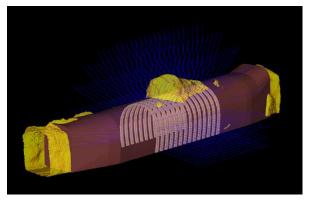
Extent of fall-out, stripping requirement and steel arch support
